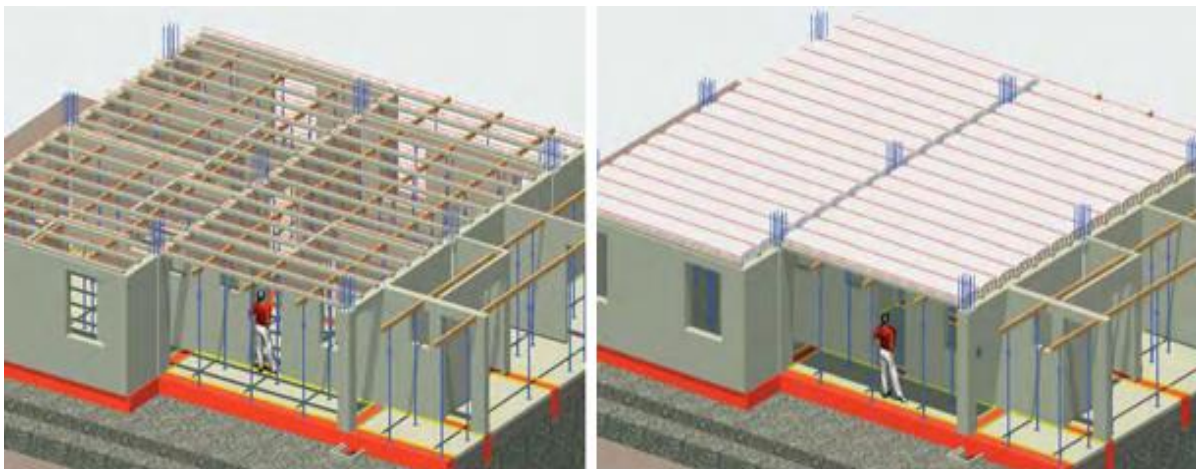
Left) Installation of precast beam design Right) Installed precast beam and slab hallow blocks arc design GTZ and MH engineering
